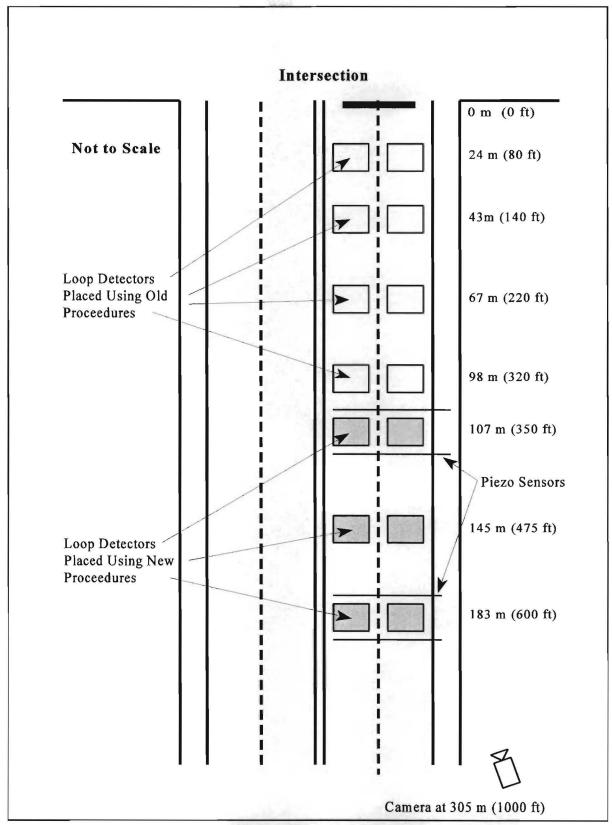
Location of Testing Equipment at Typical Signalized Intersection.
